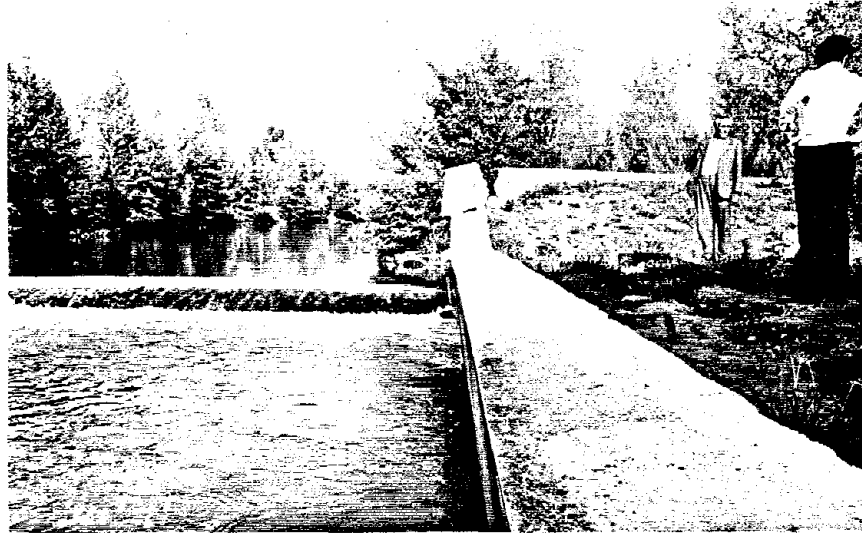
WEIR ON THE LEDRA RIVER:DAMAGED RETAINING WALL - FROM (10)
